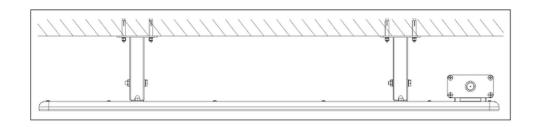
Mounting bracket and anchor dowels provided. Connection from the wall to the infrared heater
